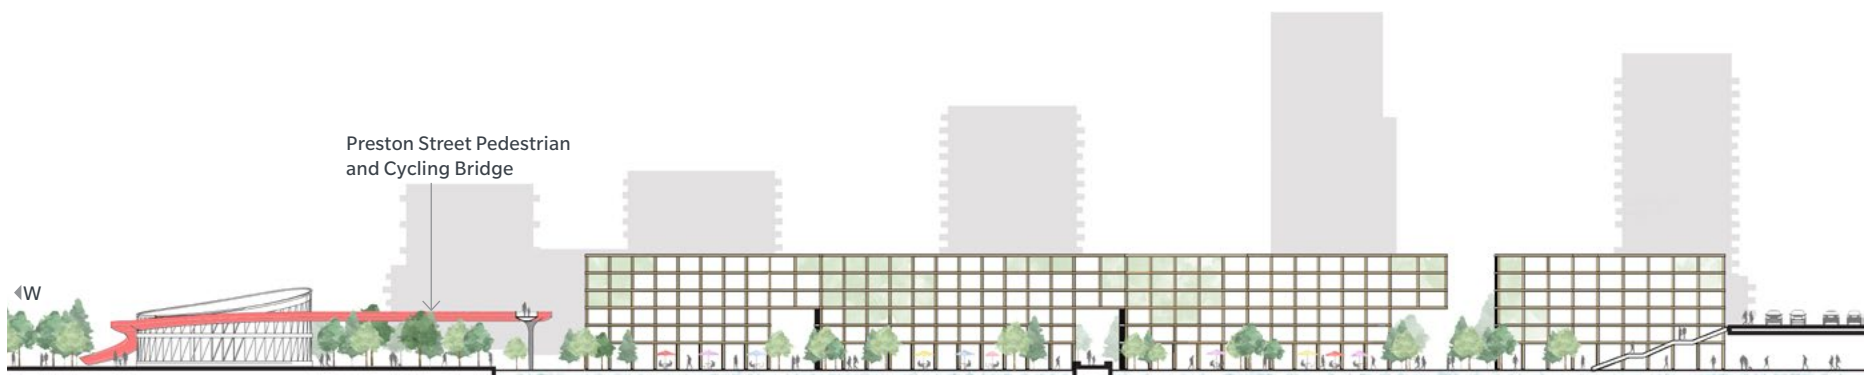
| Sectional elevation (west to east) illustrating the Preston Street pedestrian and cycling bridge and the Aqueduct District.
